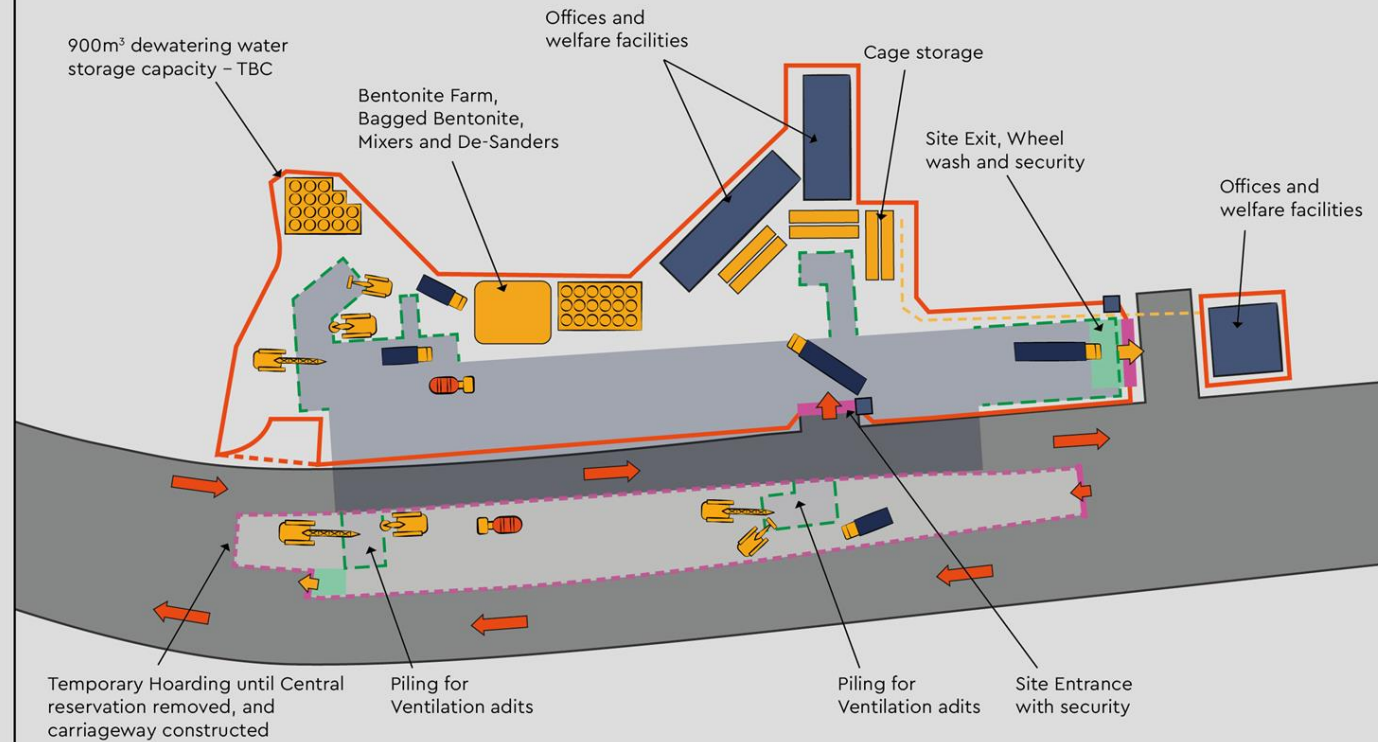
Collins Avenue Station – Stage 1 - Site Establishment
